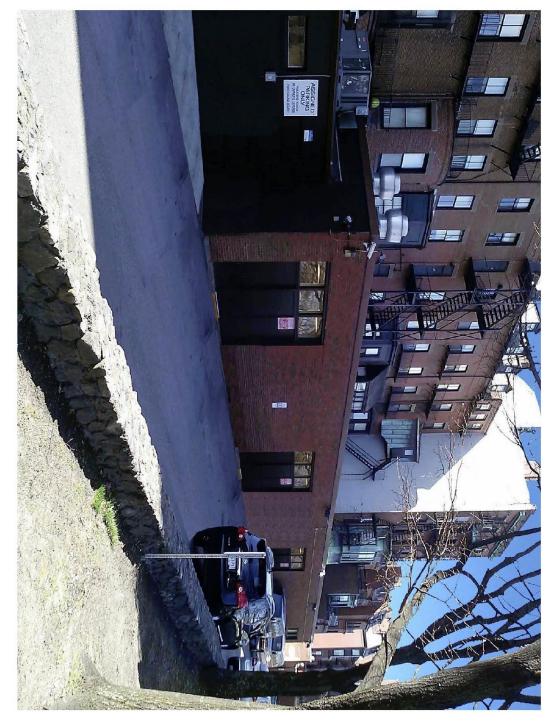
PROPOSED MALL ROOF PERIMETER ENCLOSURE
